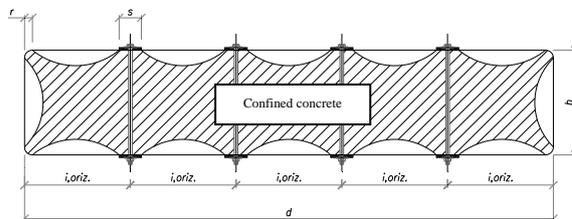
Confinement of rectangular section using FRP sheets and transversal steel bars.
